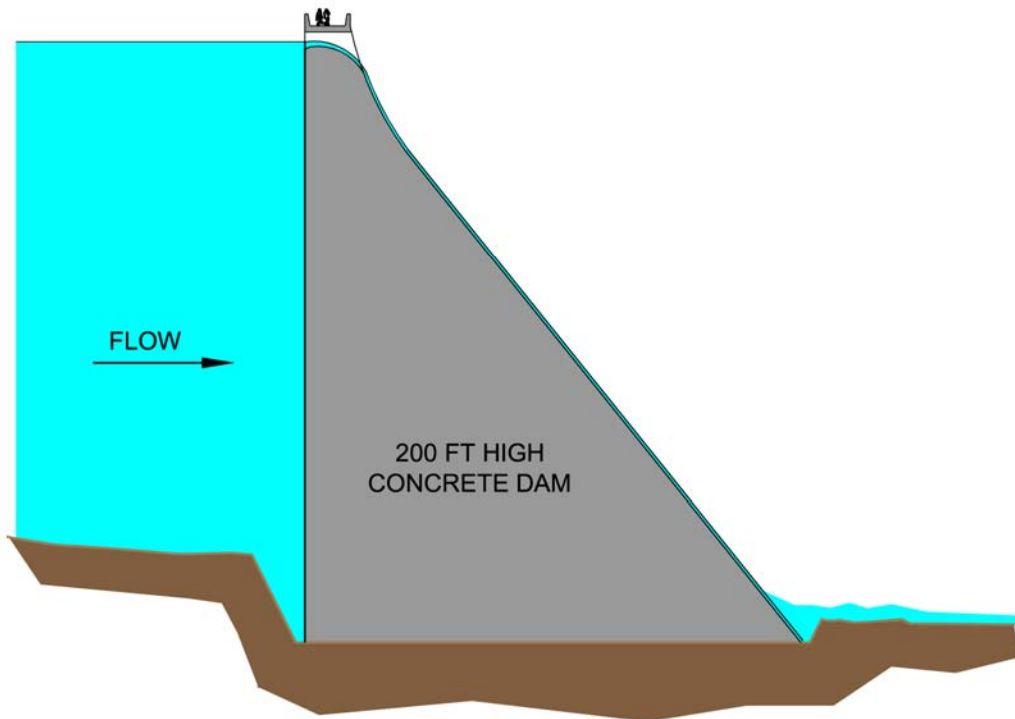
Section of Stetson Creek Warming Pond Dam
